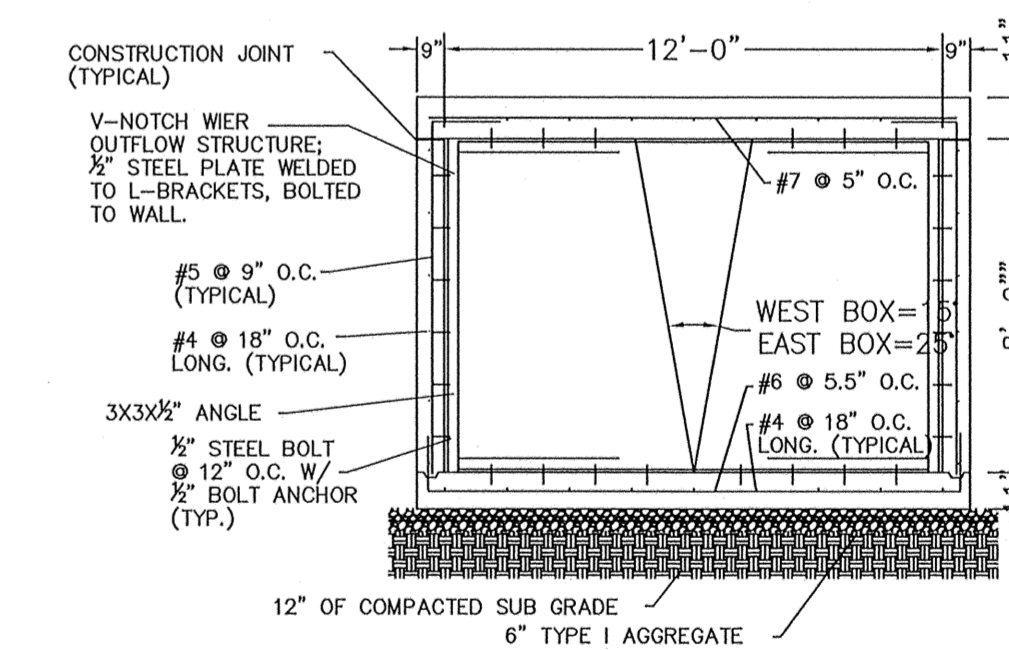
DETAIL OF TRANSVERSE JOINT THRU BARREL OF CULVERT
